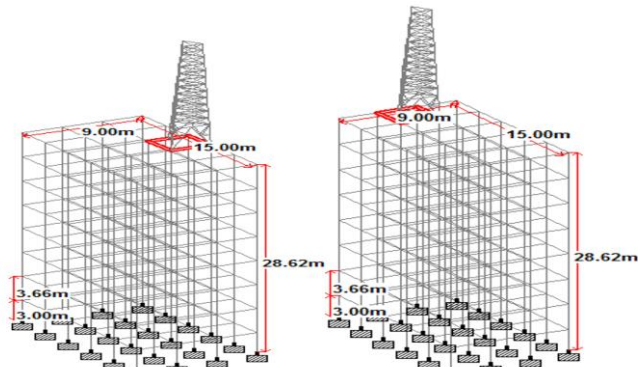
3D Elevation Model-3 Figure: 4 3D Elevation Model-4
